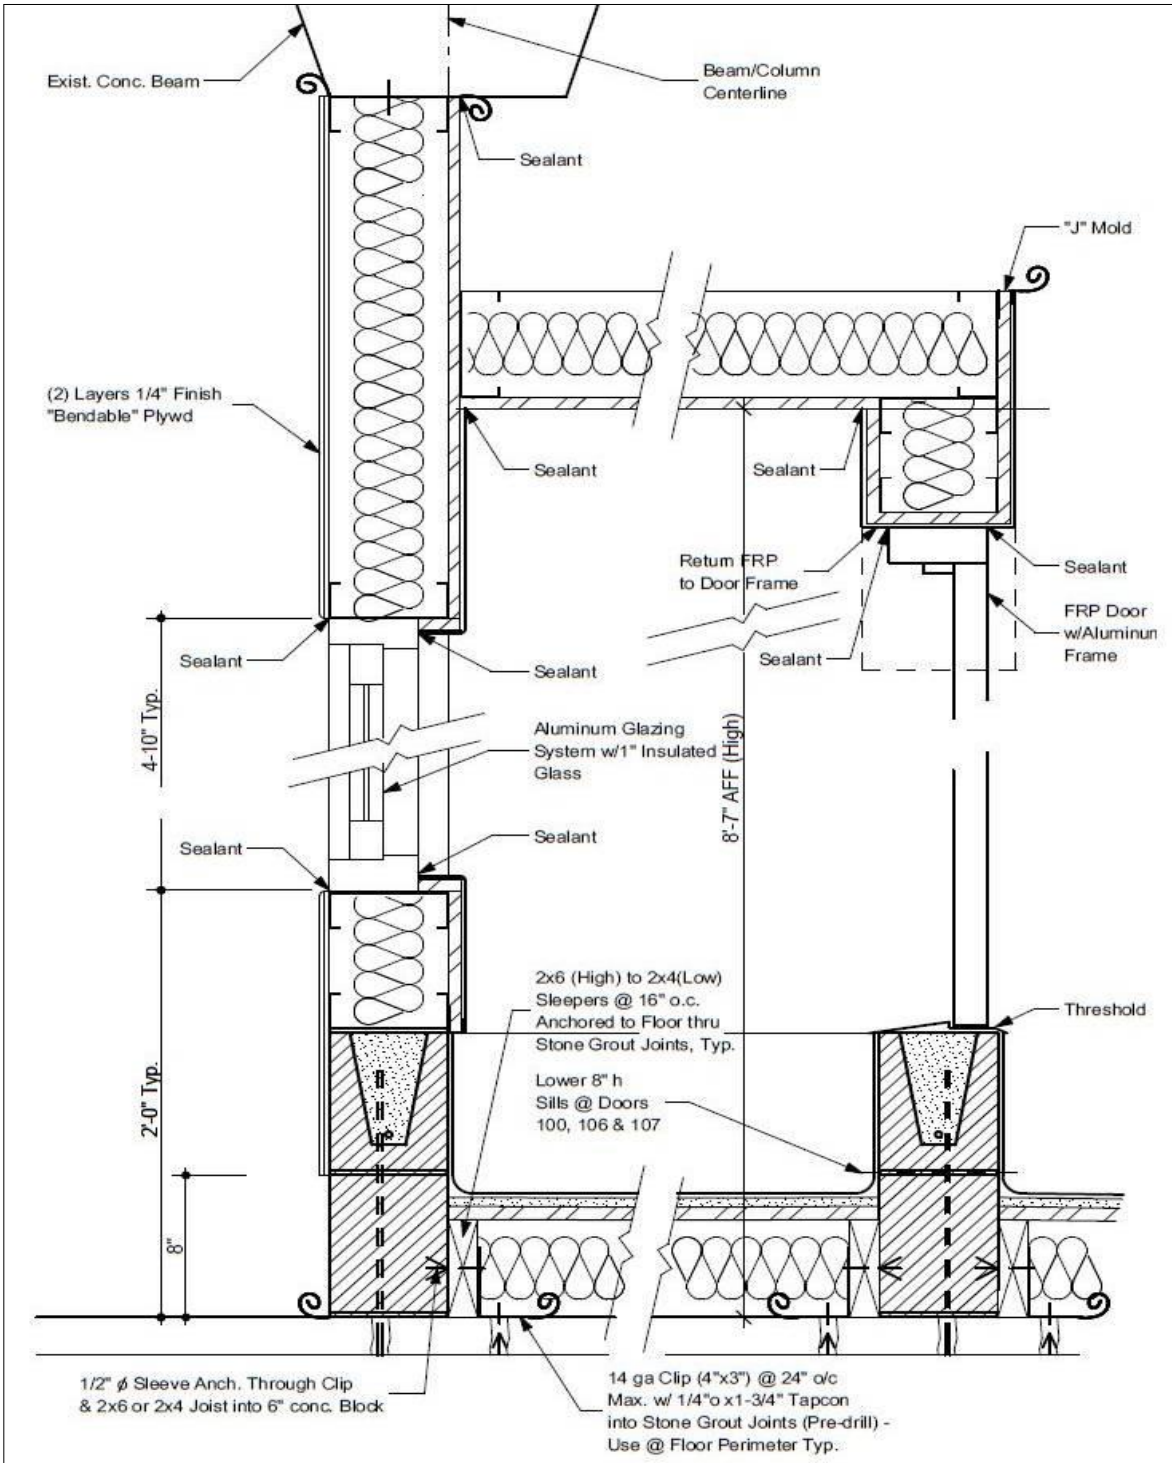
Detail for the floor, wall, and door structures. Note the elevated door threshold to prevent water from exiting and entering the room under the entrance door.
